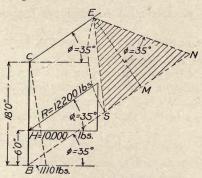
Diagram of Forces for Reinforced Concrete Retaining Wall.
